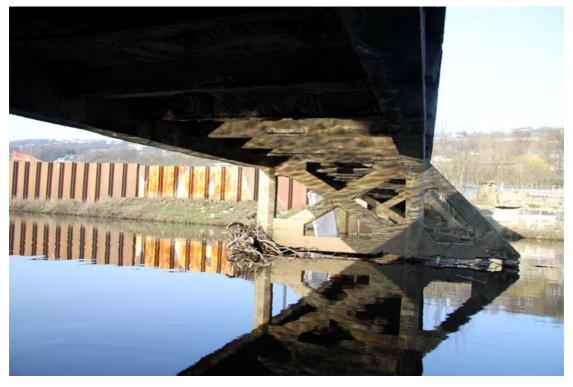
North-facing view beneath bridge showing trestles with diagonal internal bracing (4b) and (4a) and cut waters (5a) and (5) (IMG_2415)
